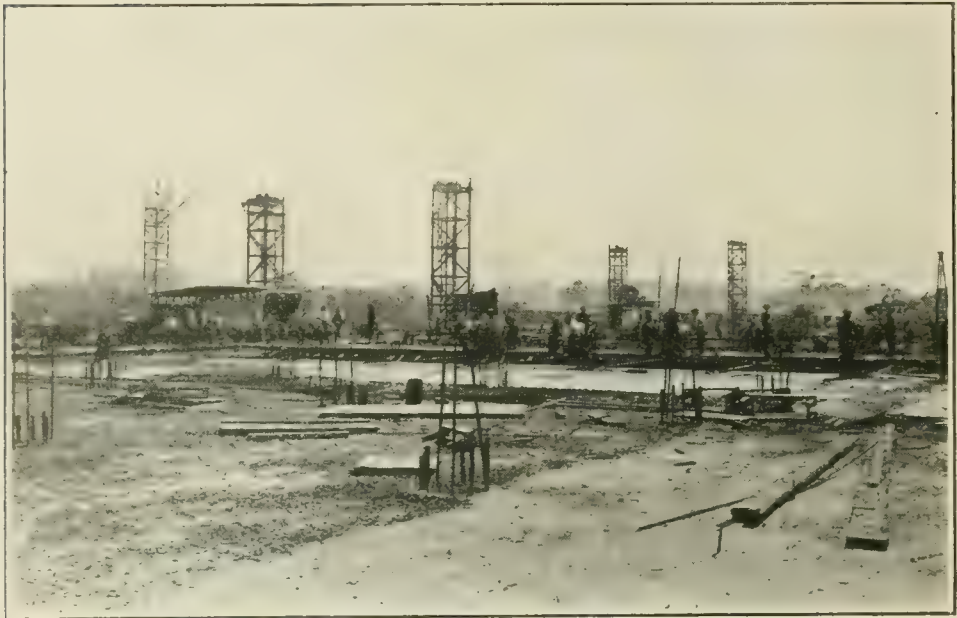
GENERAL VIEW OF TYPICAL FLOOR, SHOWING CONCRETE POURED, ROUGHENED, WHERE FINISH IS TO BE APPLIED LATER.
